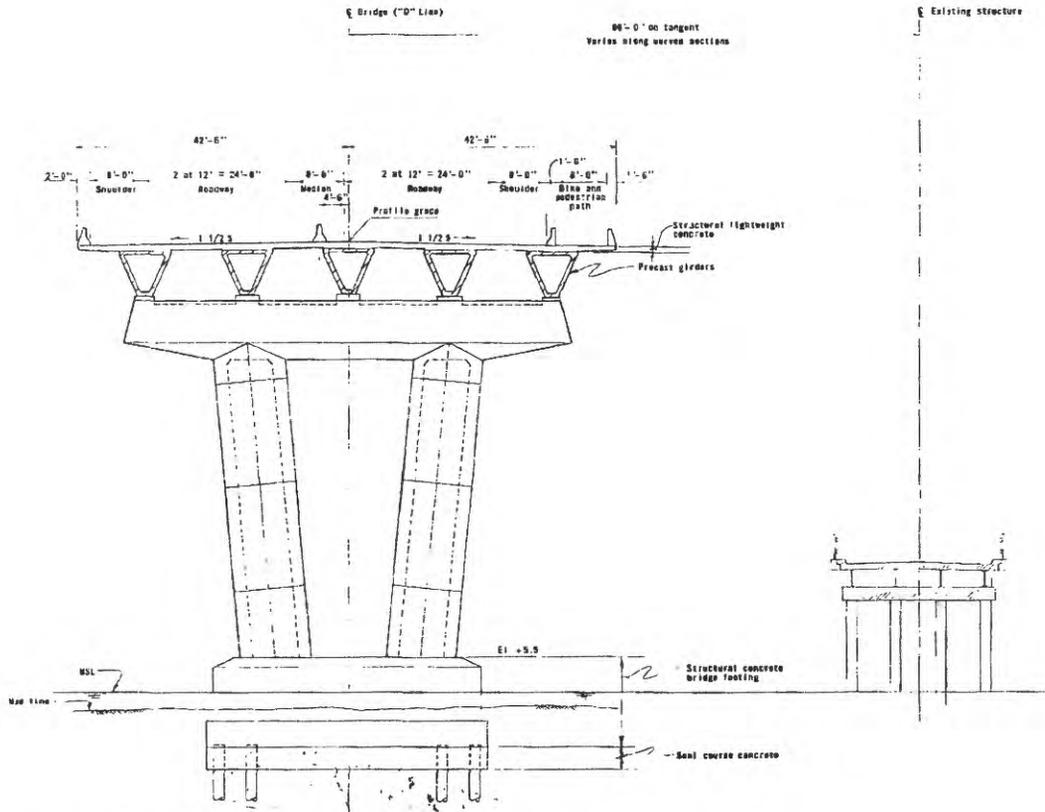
Typical Section for approach spans of Dumbarton Bridge.
